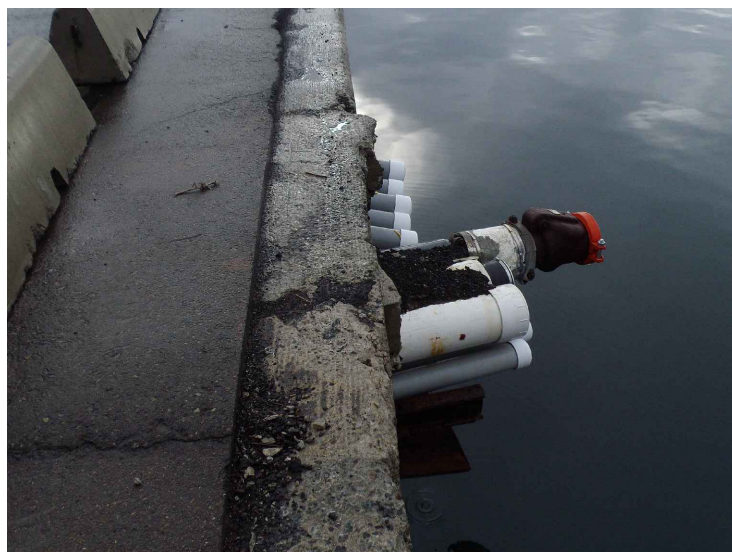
UTILITIES TERMINATED AT THE WEST FACE OF THE TIMBER CRIB
